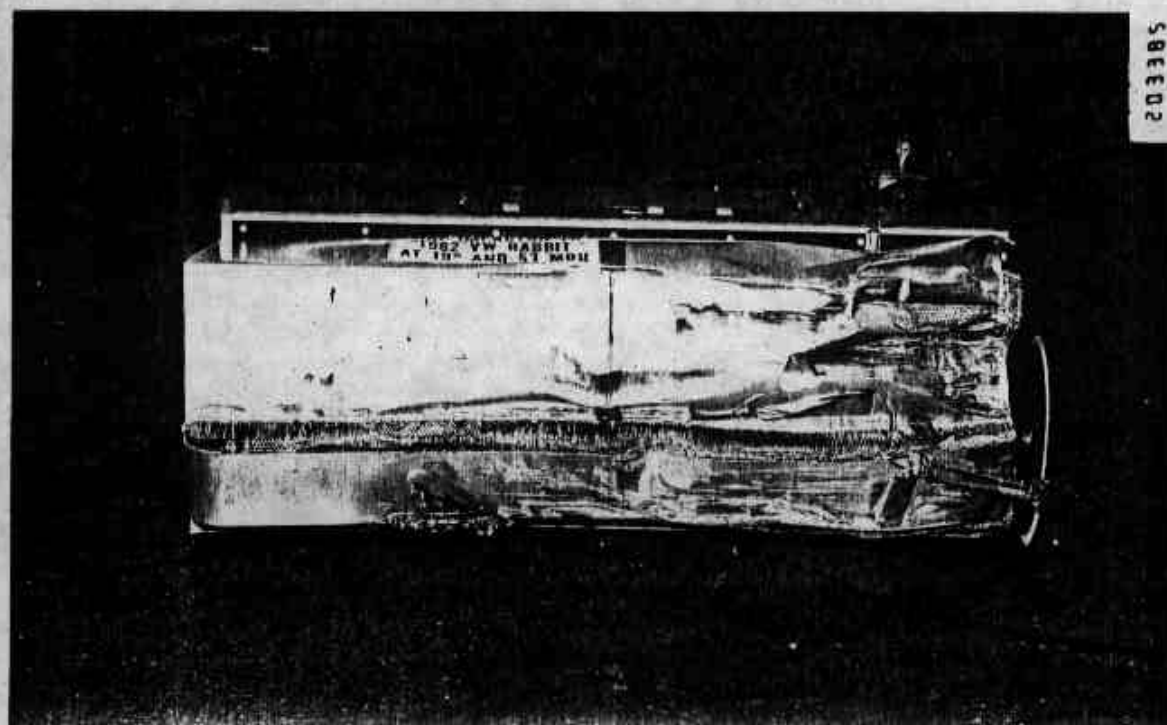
POST-TEST FRONTAL VIEW OF BARRIER FACE.
